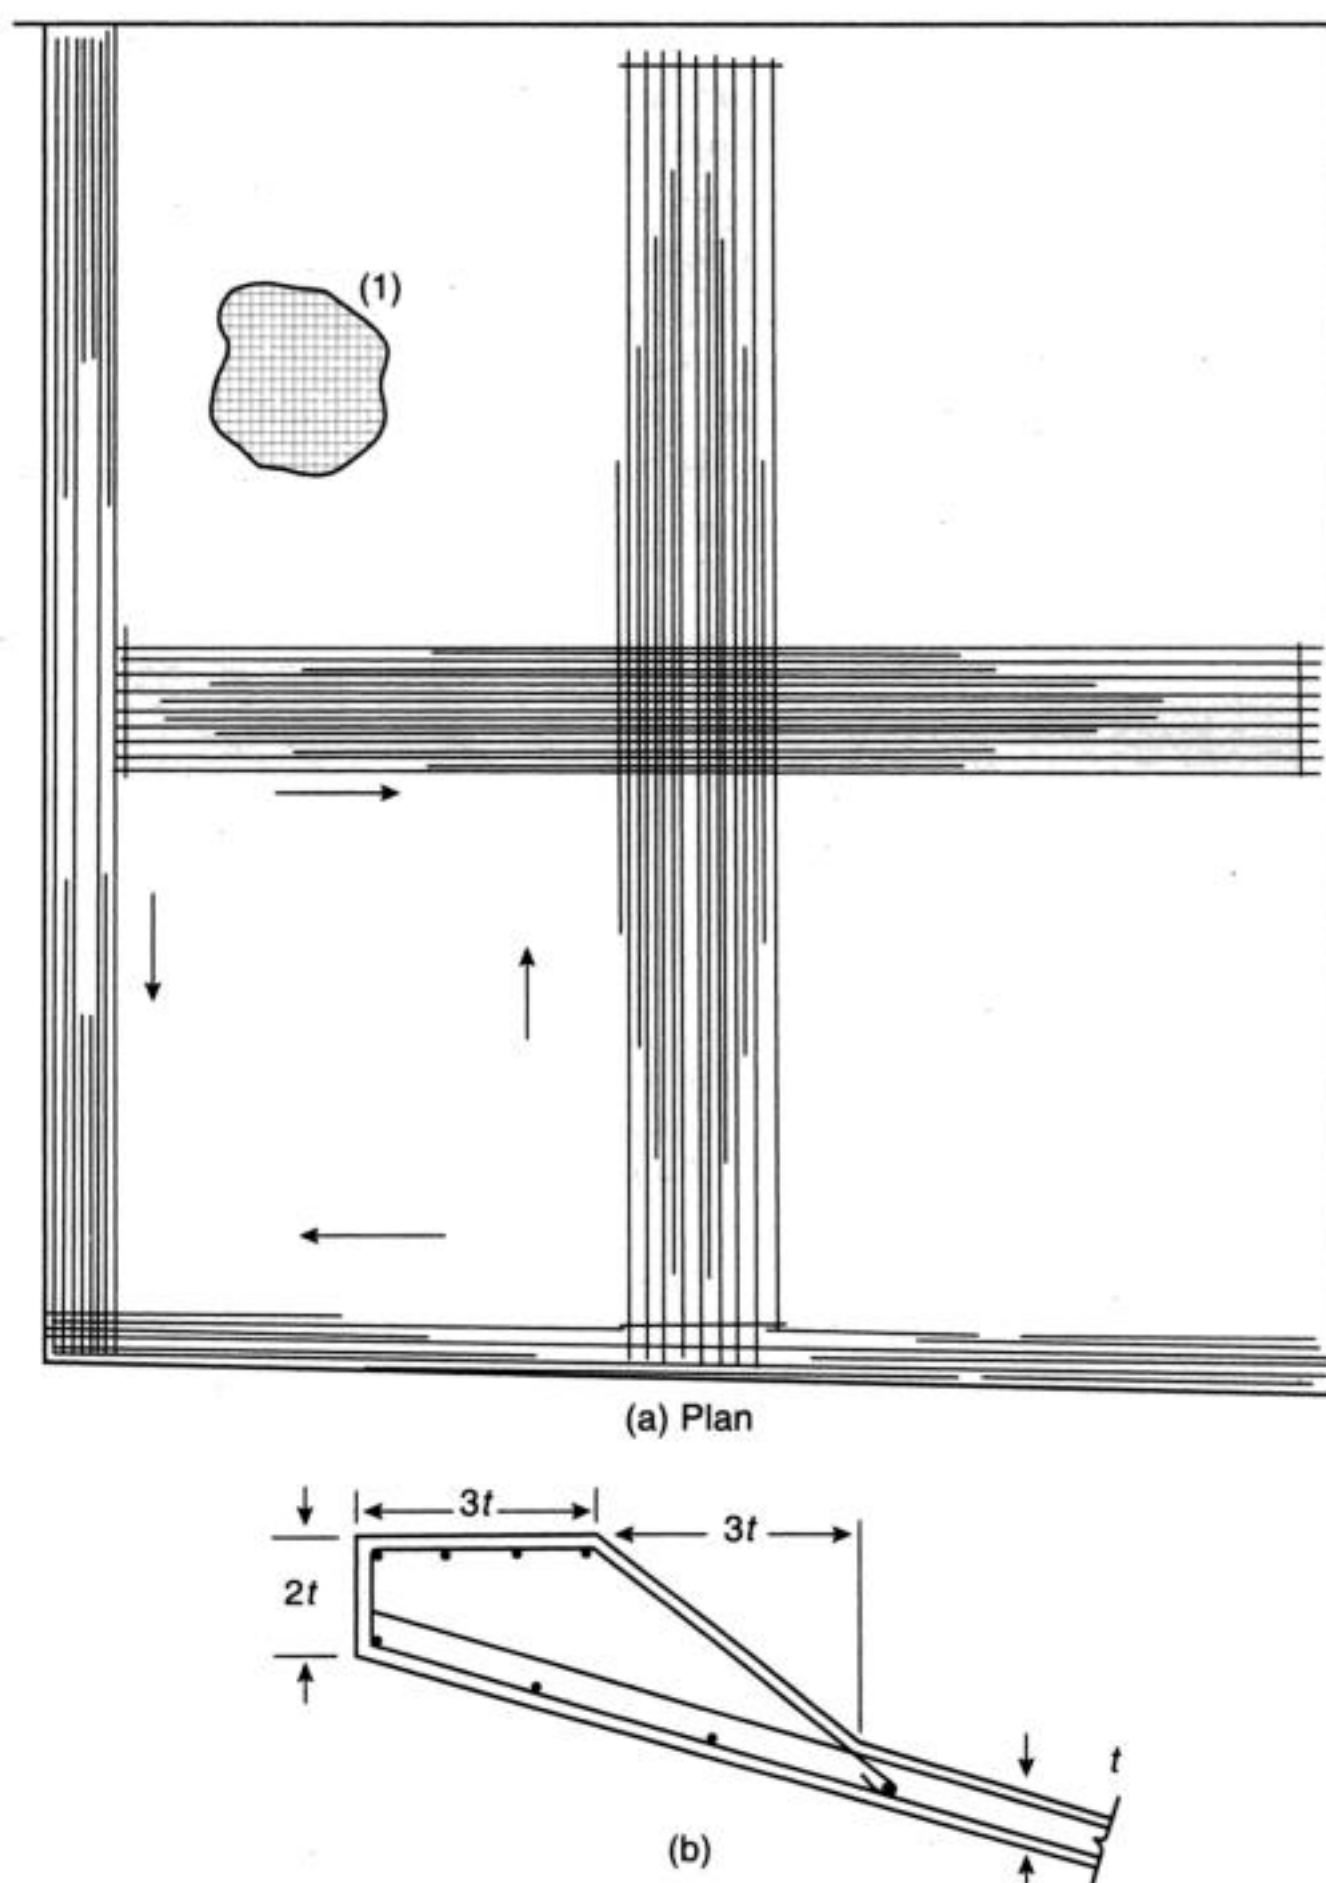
Inverted umbrella hypar roof: (a) Plan shows curtailment of reinforcements in edge and ridge members (1) Shell reinforced both ways with central layer of steel or two layers one on top and the other on bottom of shell, and (b) Formation of edge member by gradual thickening of shell as an alternative to rectangular beams.
